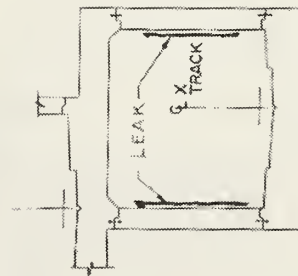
WATER INFILTRATION THROUGH THE WALLS
